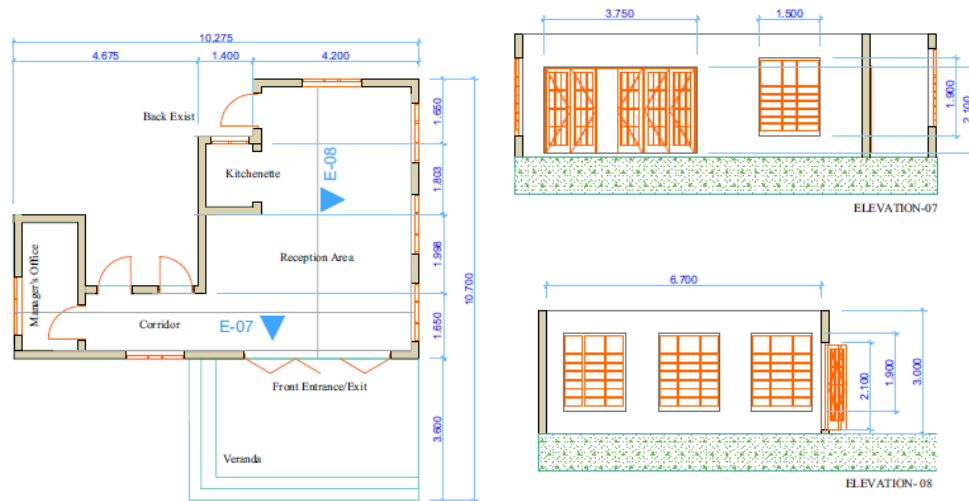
Existing Site Plan and Elevation (Source: Author)
